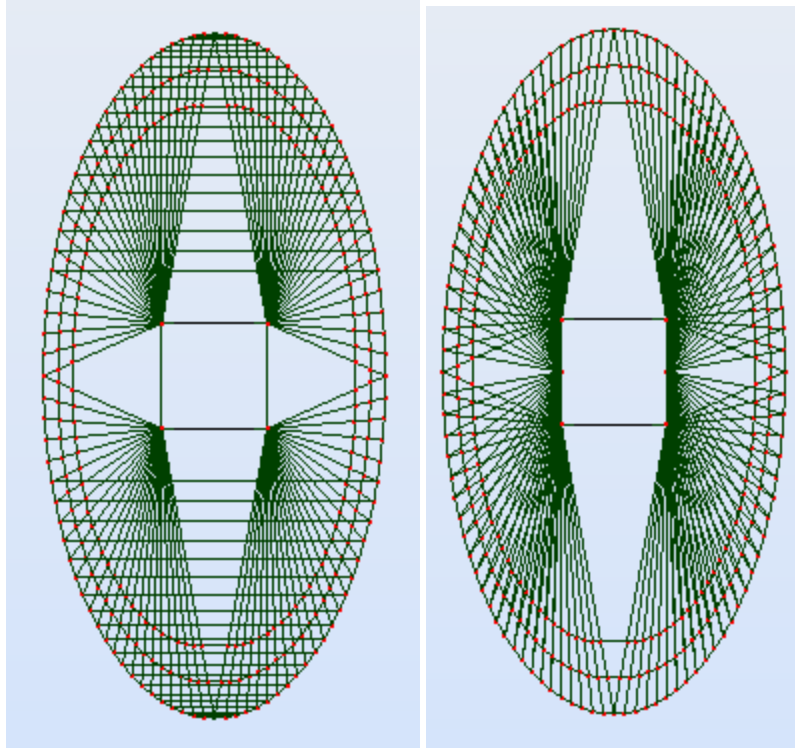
Cross-sections of the 65 by 130 foot models with top & bottom bracing (left) and center deck bracing (right).
